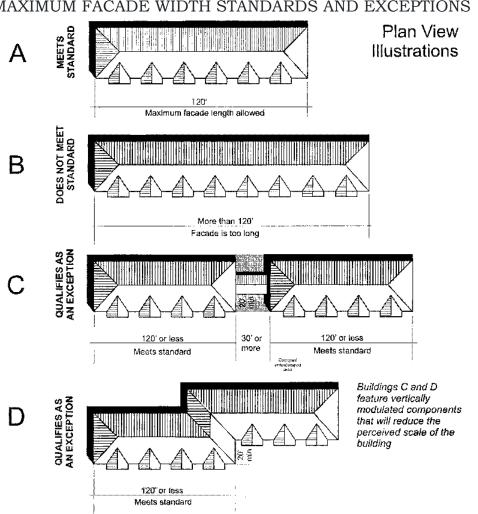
MAXIMUM FACADE WIDTH STANDARDS AND EXCEPTIONS
